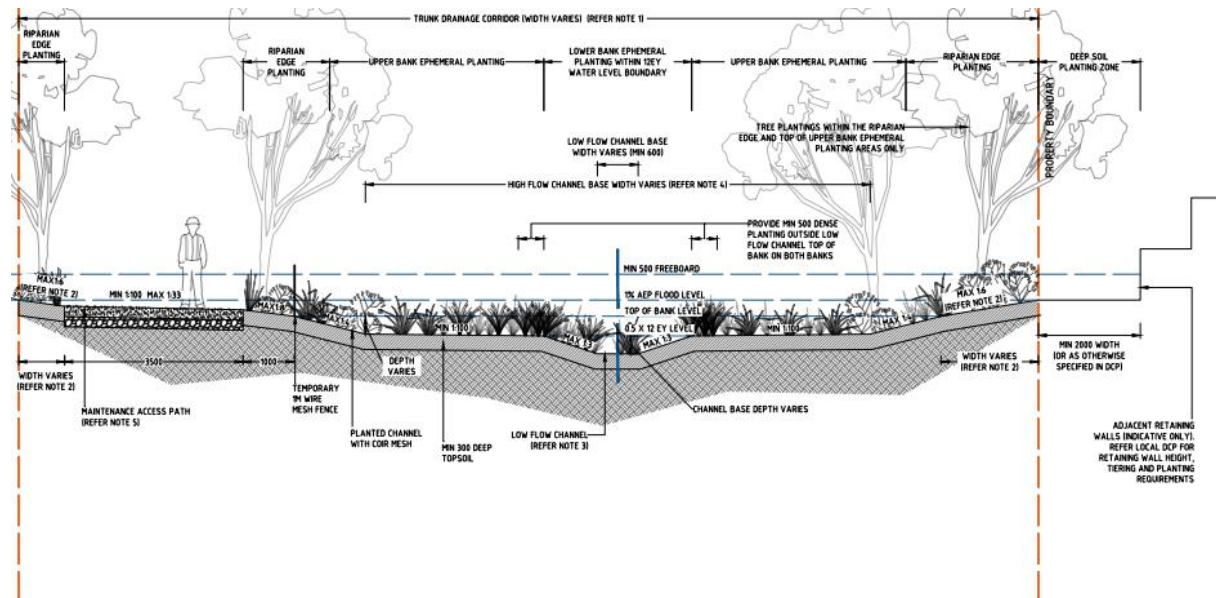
Draft Typical Trunk Drainage Channel type 1 (Sydney Water 2023)
